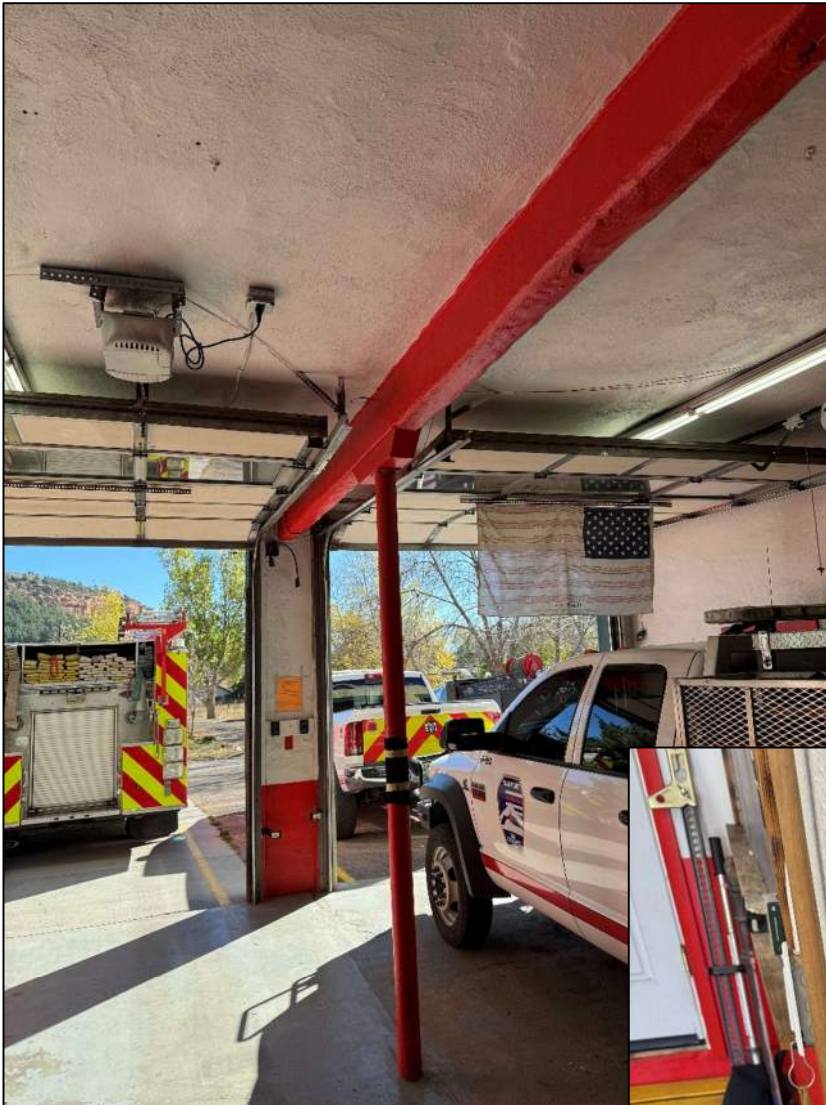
Inside Bays #2 and #3 looking east. Note red beam bisecting the bays and steel post. Plaster is on the ceiling and all wall surfaces.
